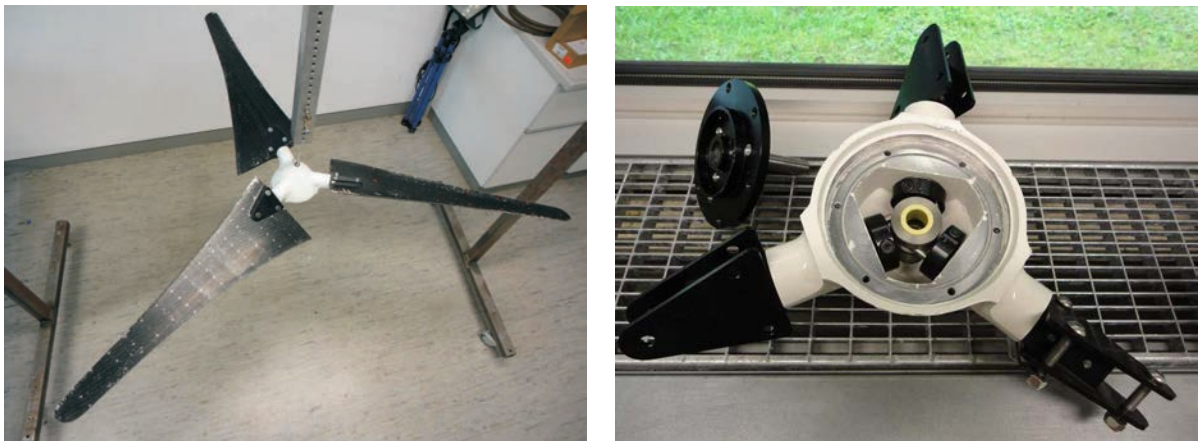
Left: Rotor assembly in free condition. Right: Interior of the hub.
